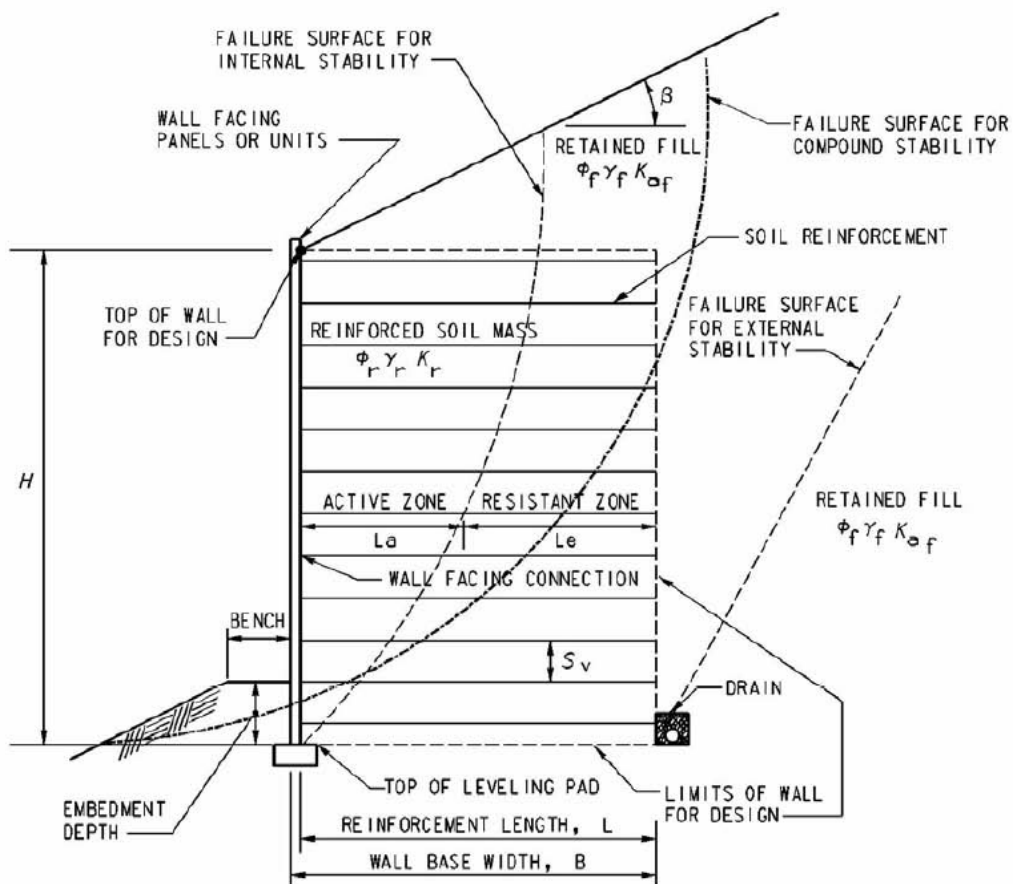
MSE Wall Element Dimensions Needed for Design
